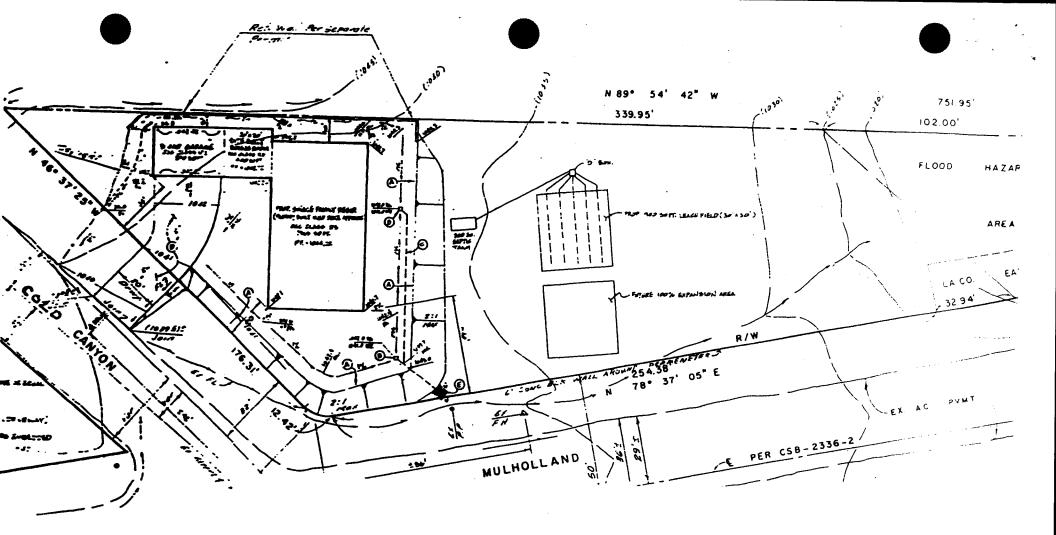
EXHIBIT NO. TIL APPLICATION NO. 4-96-176 (Kasco) Site Plah
